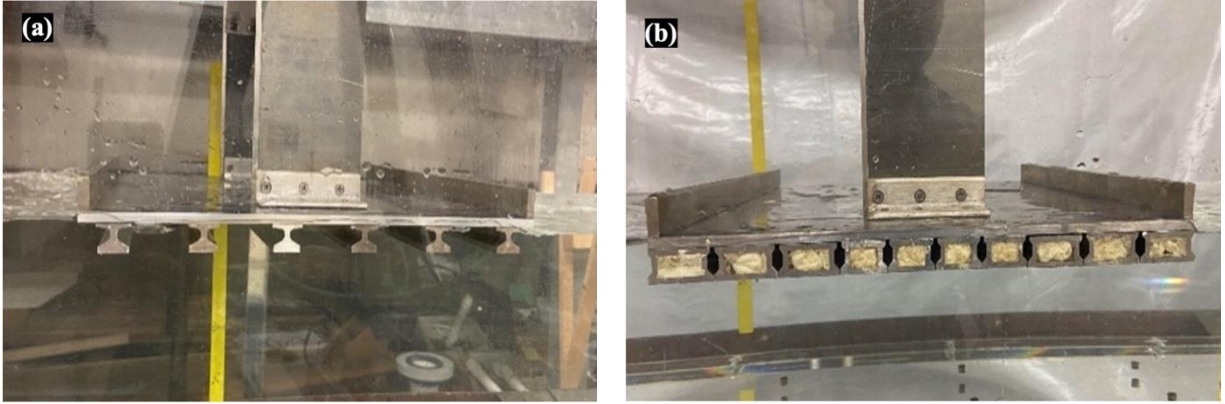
Bridge superstructure scale models with (a) I-girder, (b) box beam
